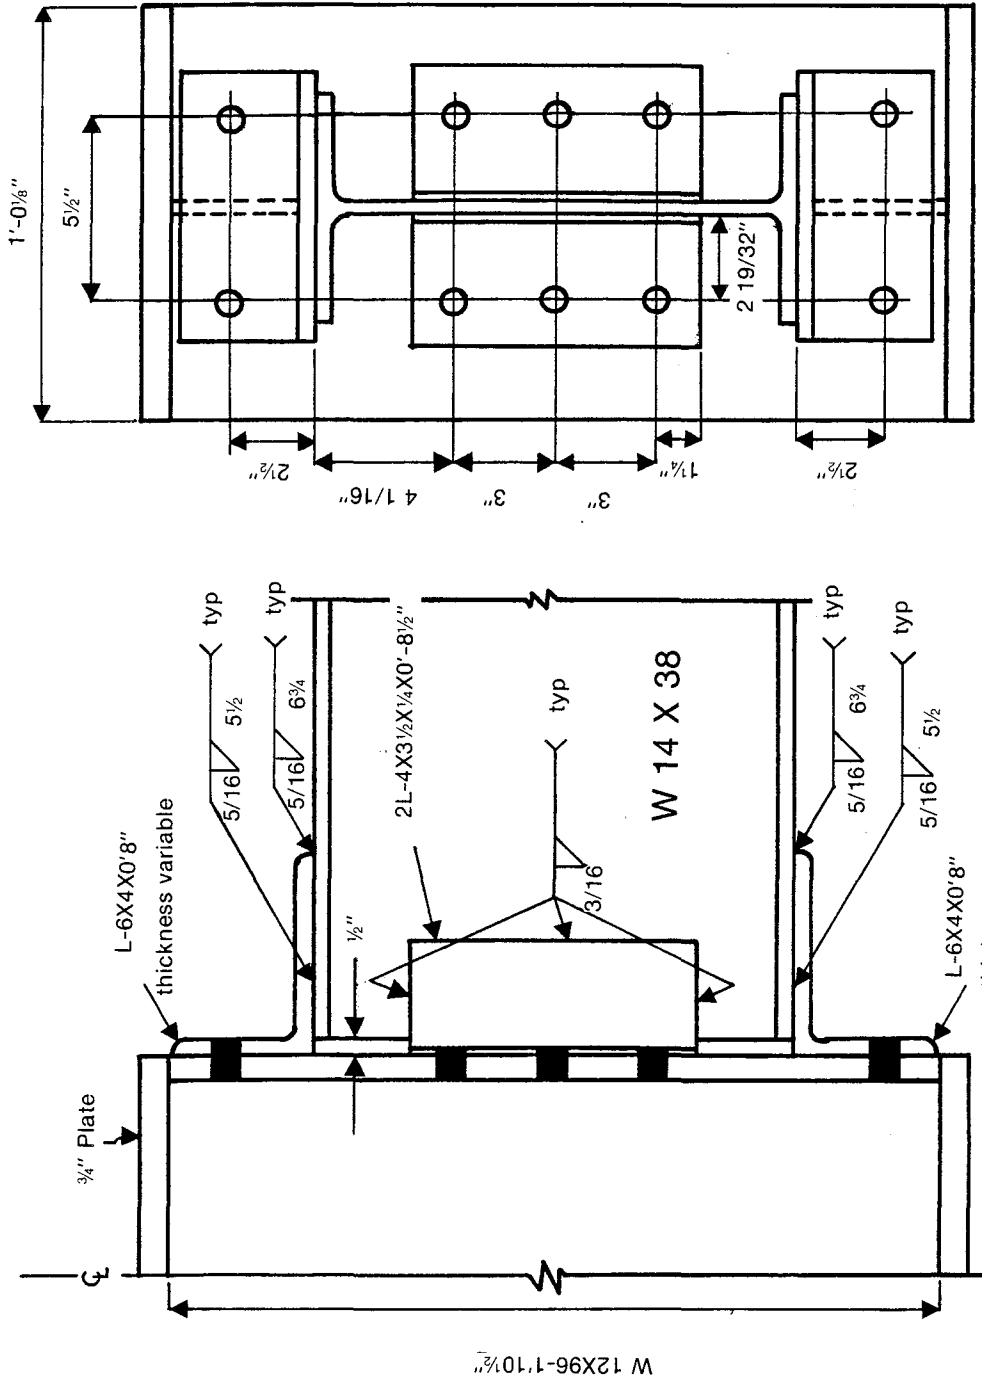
DETAILS OF CONNECTION FOR W14X38 BEAM — BOLTED — WELDED SPECIMENS
